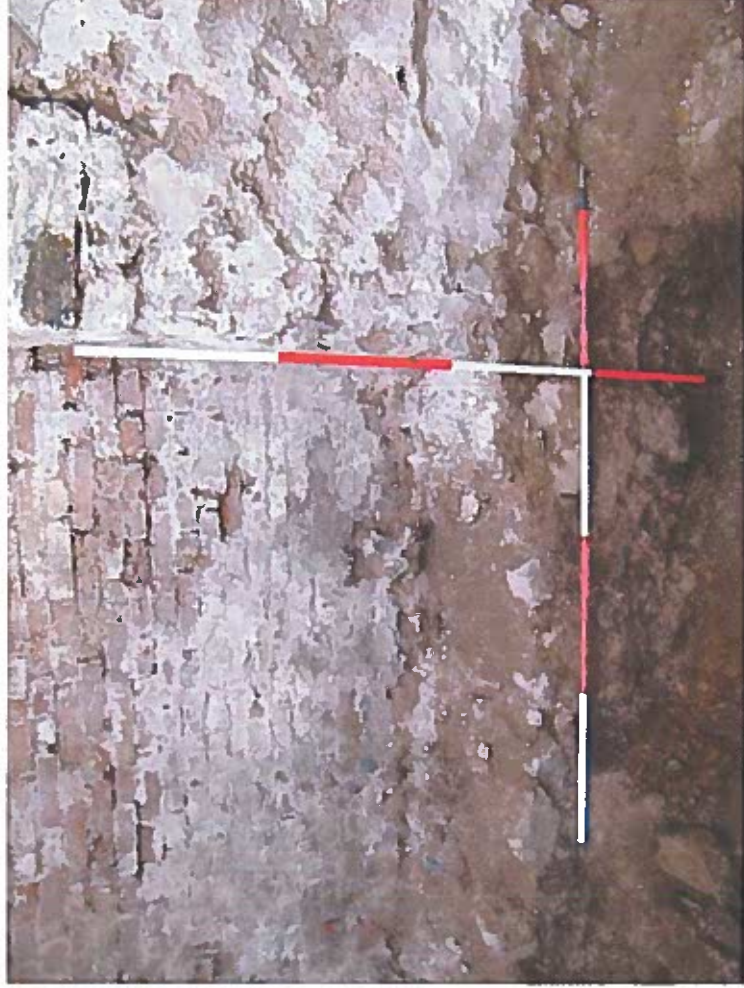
Section through the underfloor layer in the north wall test pit, view from the W
